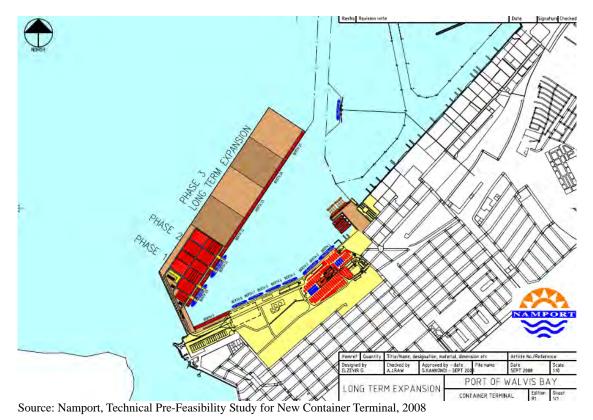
Proposed Alternative Expansion Plan 2 (2008)
